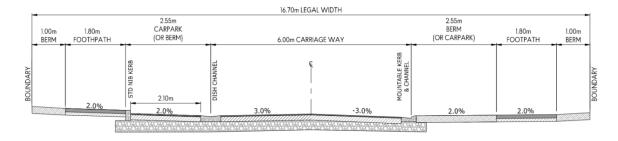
Typical Cross-Section (F) Local Road - 16.7m with Carpark and Berm
